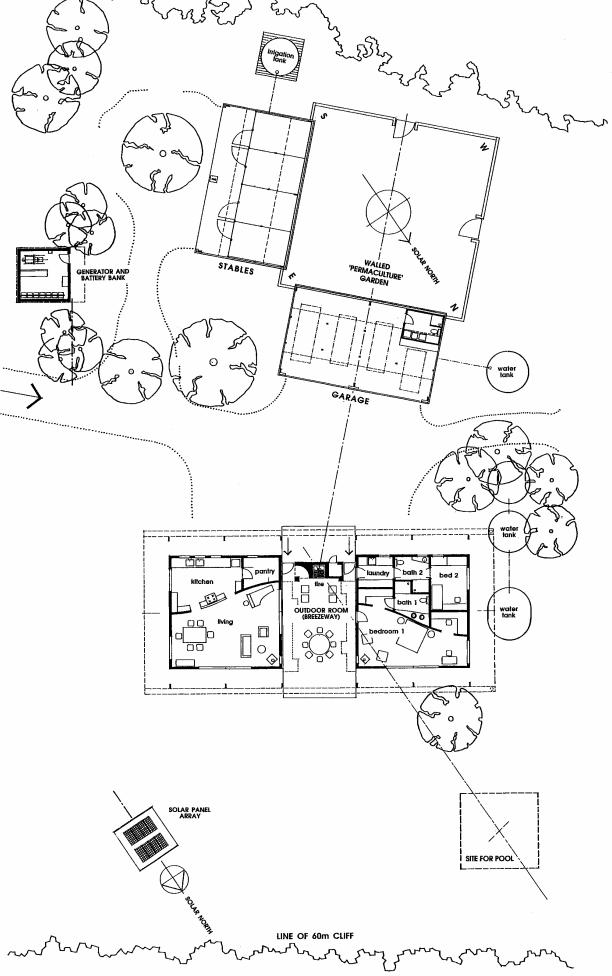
The "Four Horizons" Project. Plan of house and outbuildings
